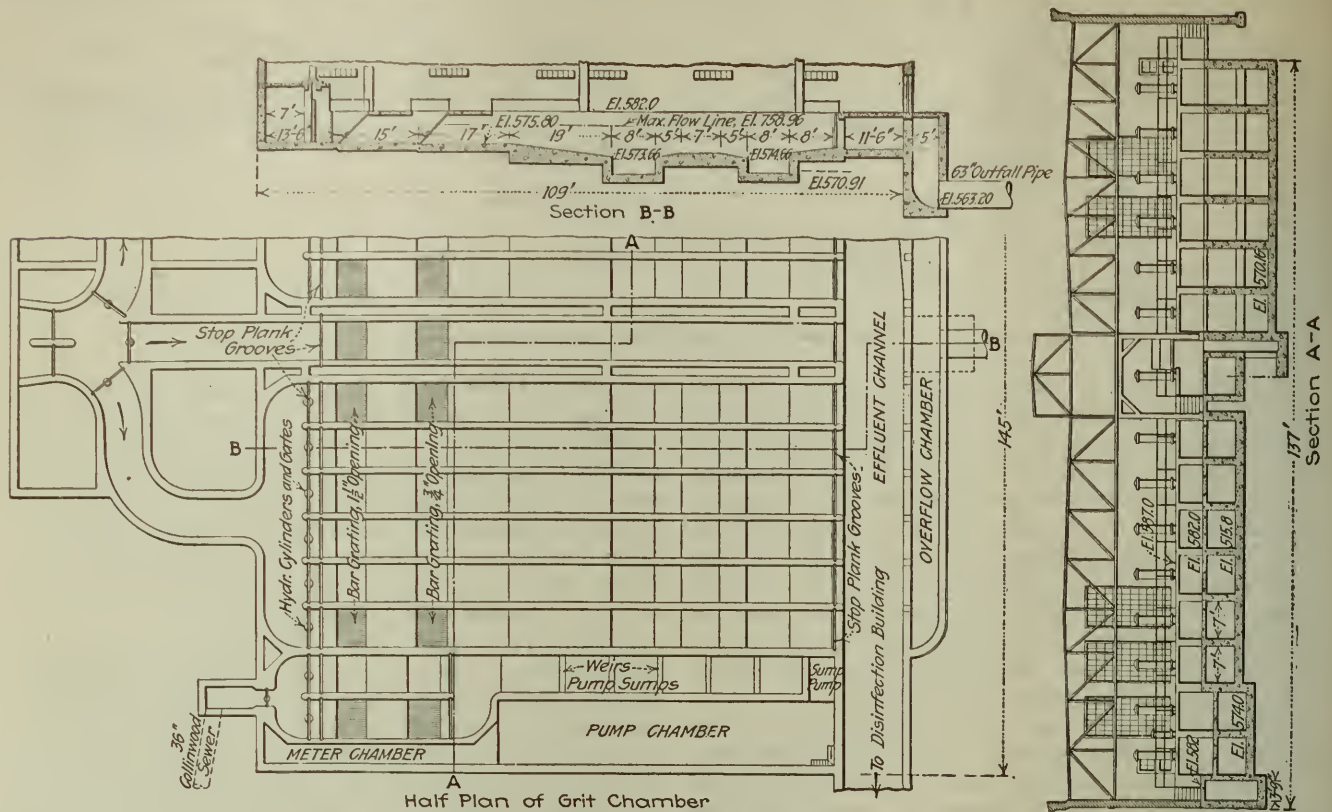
PLAN AND SECTIONS OF GRIT CHAMBERS FOR EASTERLY SEWAGE-WORKS CLEVELAND, OHIO
